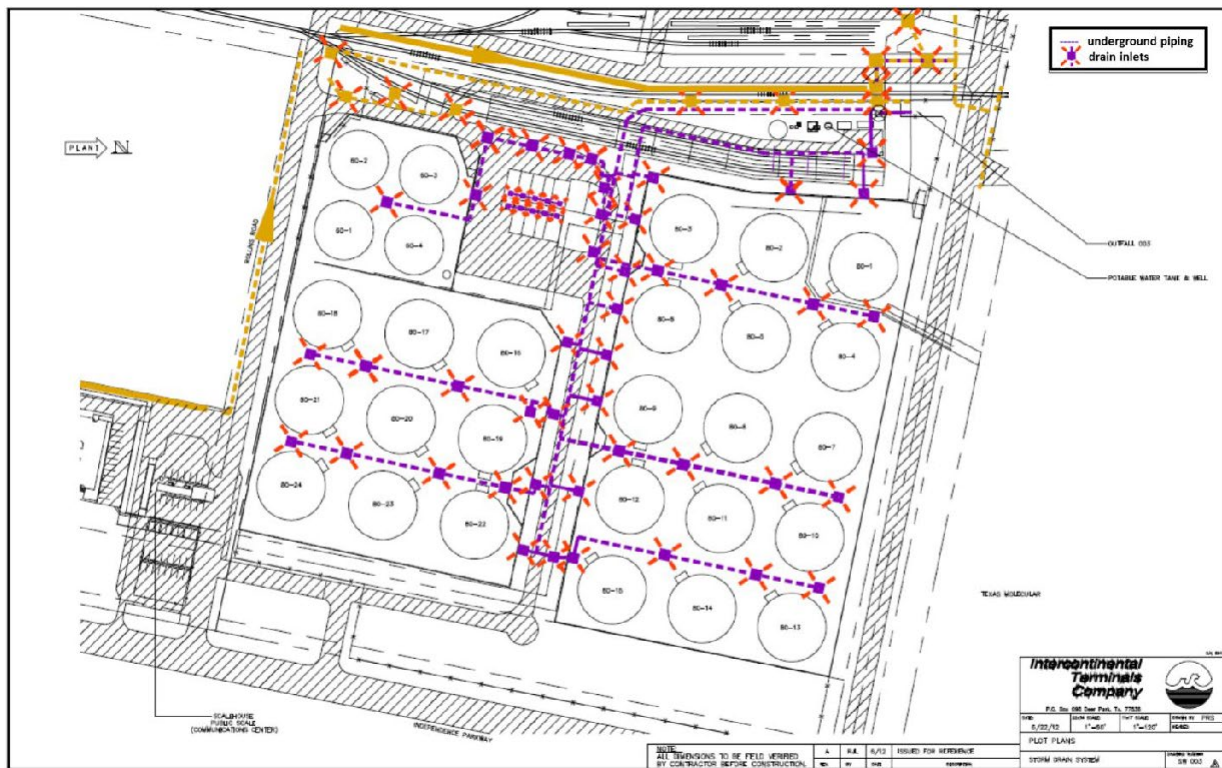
Plot plan of First & Second 80's tank farm stormwater drain system. (Credit: ITC)
